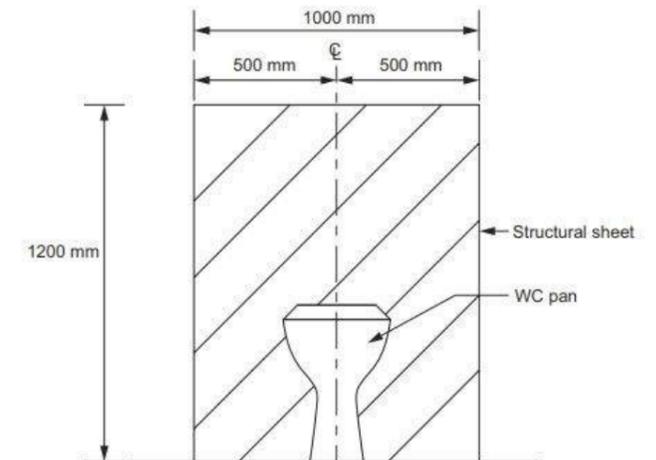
Location of sheeting for a wall behind a toilet pan
